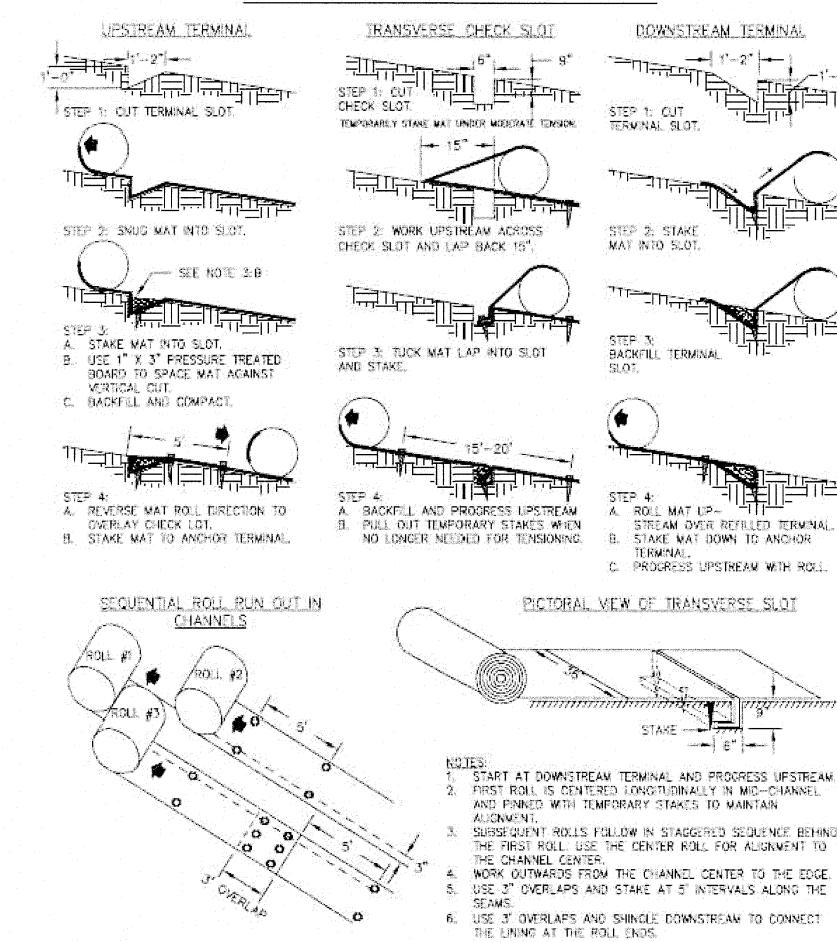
Typical Installation Guidelines for Matting and Blankets
